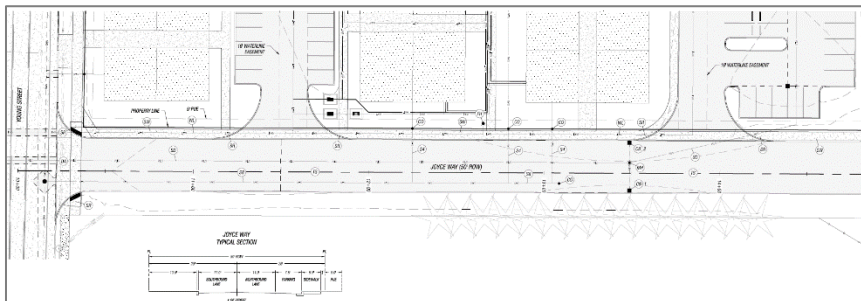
2 DR-22-06 1030 Young Street Sheet PP-2 Joyce Way east half-street
